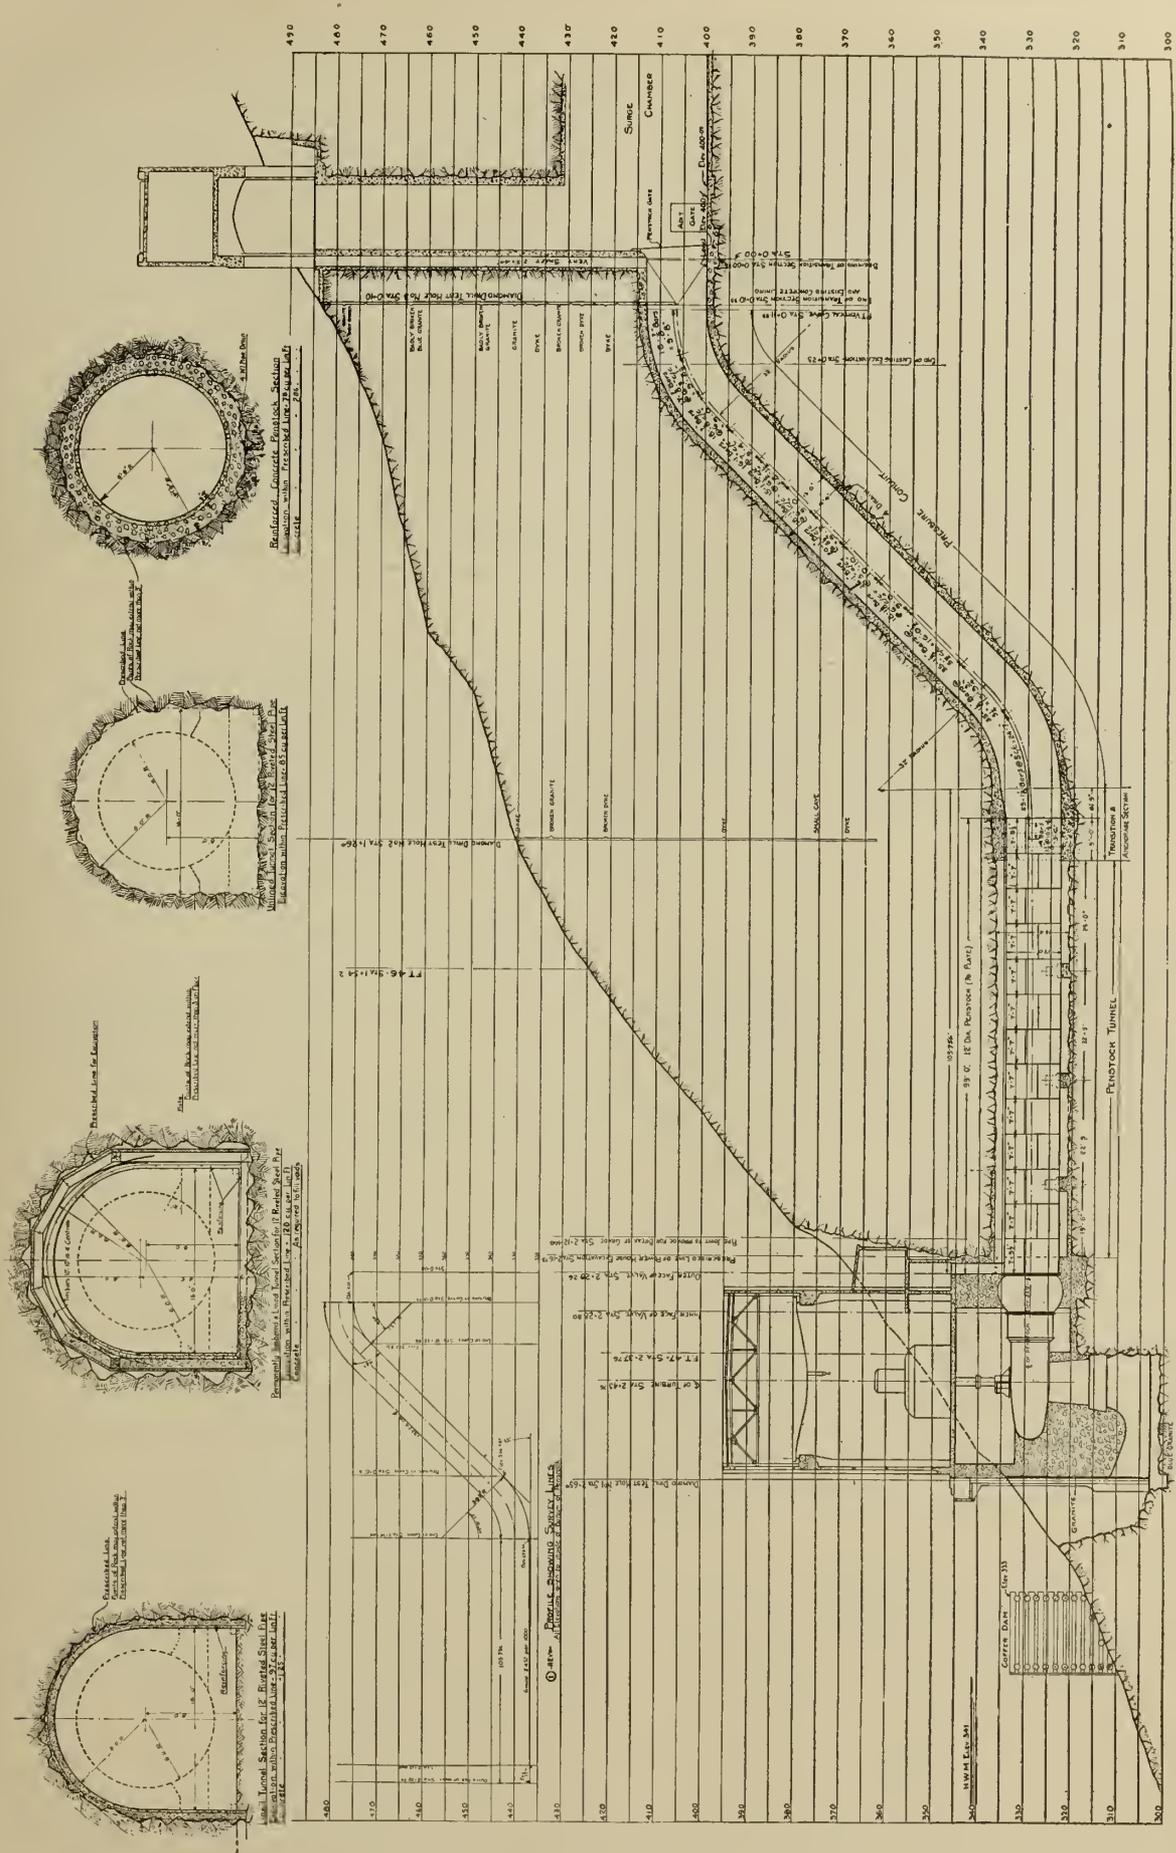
Alouette Power Development—Section of Tunnel Outlet, Penstock and Generating Station.
